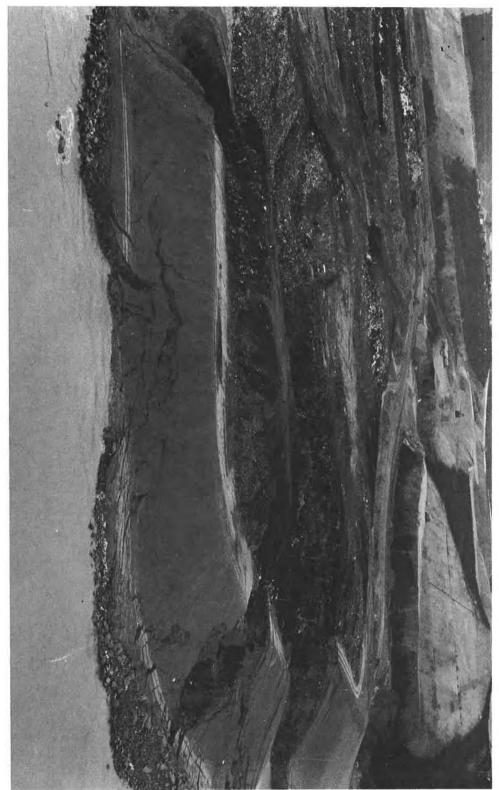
Failure of Landfill at the Junk Bay Controlled Tip. This Plate shows a failure of the southwestern corner of the Controlled Tip. Plant working on the site provide an indication of the scale of the failure.
